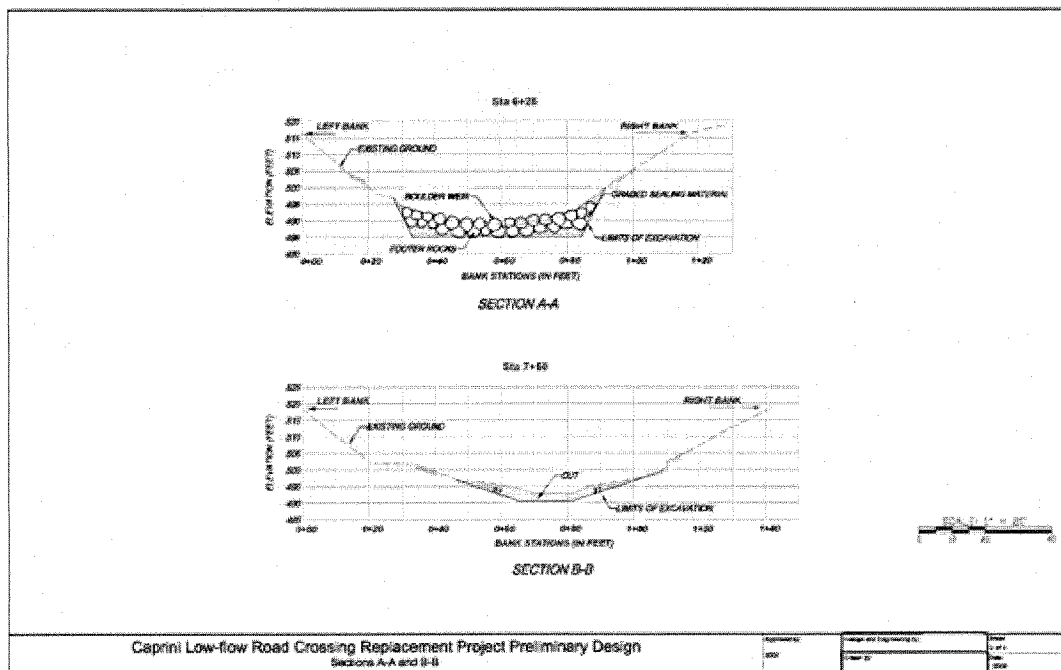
Preliminary design drawing: Section A-A and B-B for Caprini Low Flow Road Crossing Structure Replacement Project. Source: CDWR 2007. Subject to revision.
